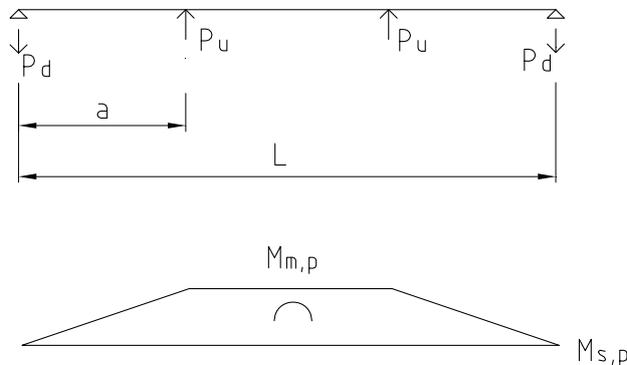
Structural schematisation of the box girder subjected to prestressing forces
